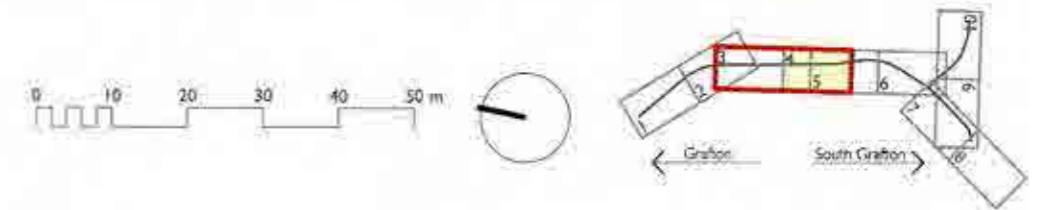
URBAN DESIGN AND LANDSCAPE CONCEPT PLAN – SHEETS 3 & 4
